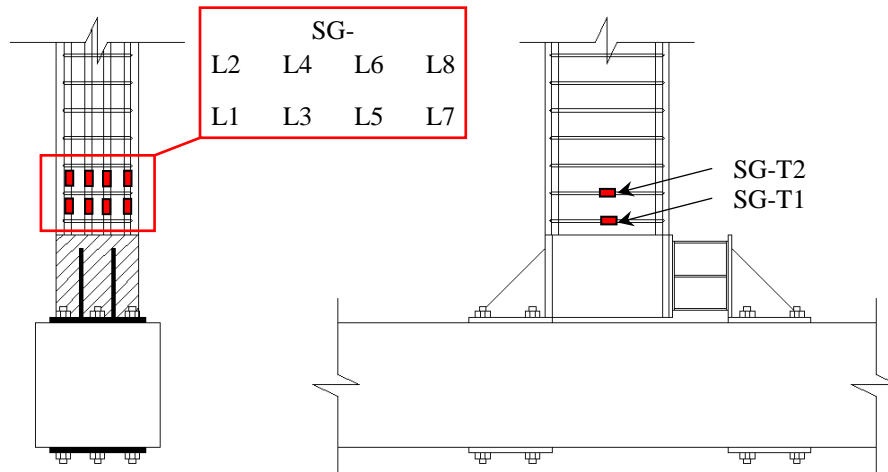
Instrumentation with SGs on reinforcing steel (specimen P-ID-1).
